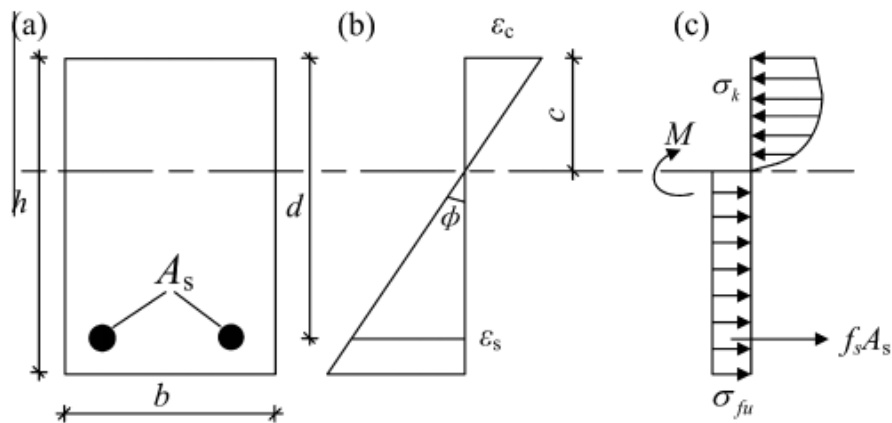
Strain and stress distribution at cross section of steel fiber reinforced concrete beam at failure:
